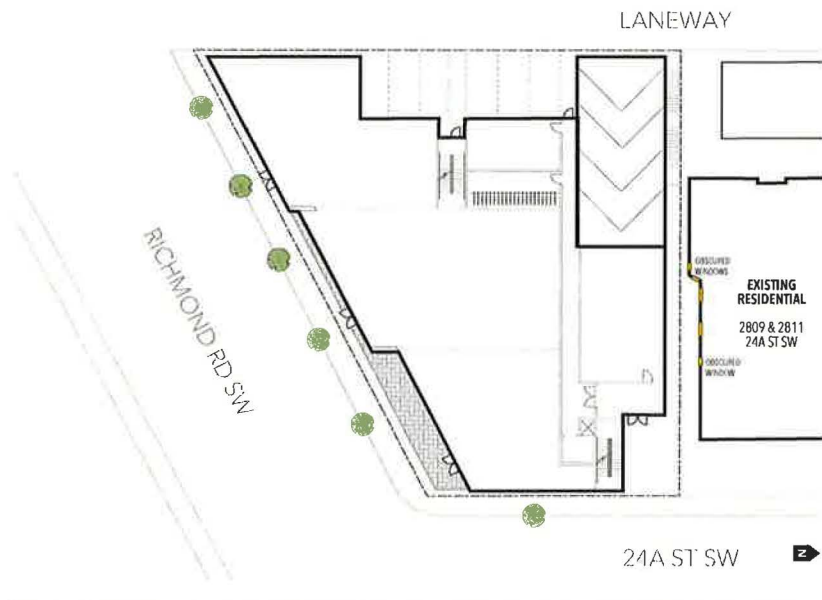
GROUND FLOOR PLAN | GROUND FLOOR WINDOWS
